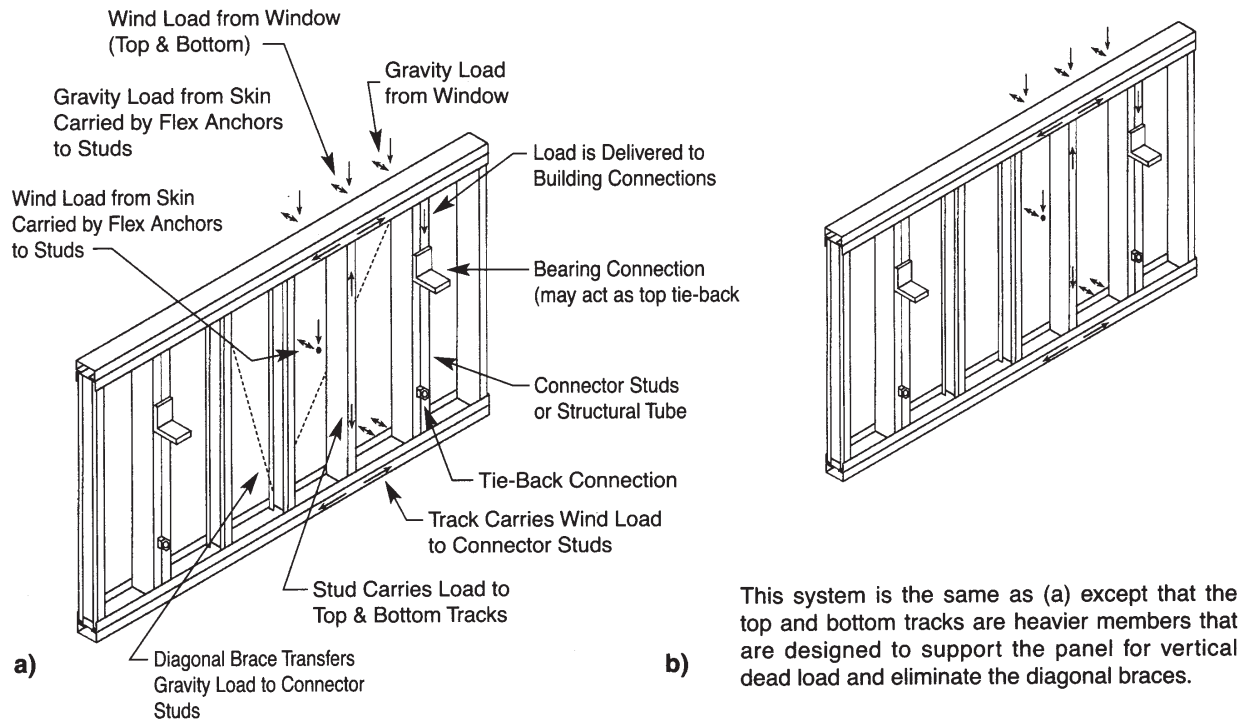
Optional methods of stiffening frame for panels without gravity anchors—for small panels only. (Taken from Glass Fiber Reinforced Concrete Panels, Fourth Edition, PCI. Used with permission, Precast/Prestressed Concrete Institute.)
